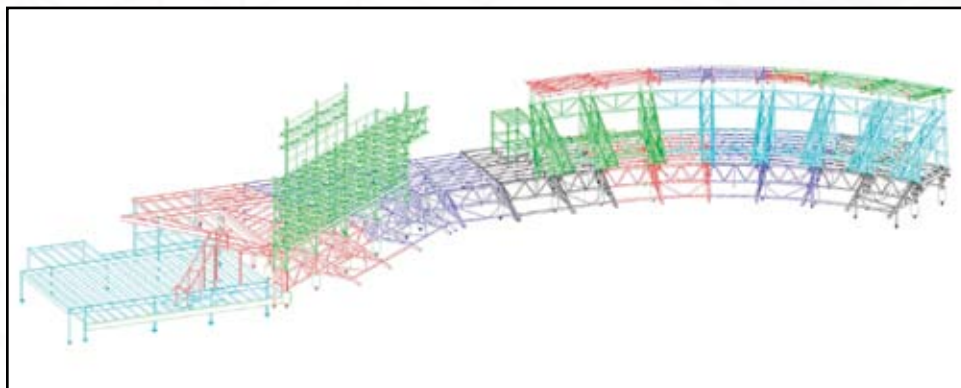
Partial view of the Tekla model used through out the design and fabrication process; Courtesy of Banker Steel and Mountain Enterprises.
